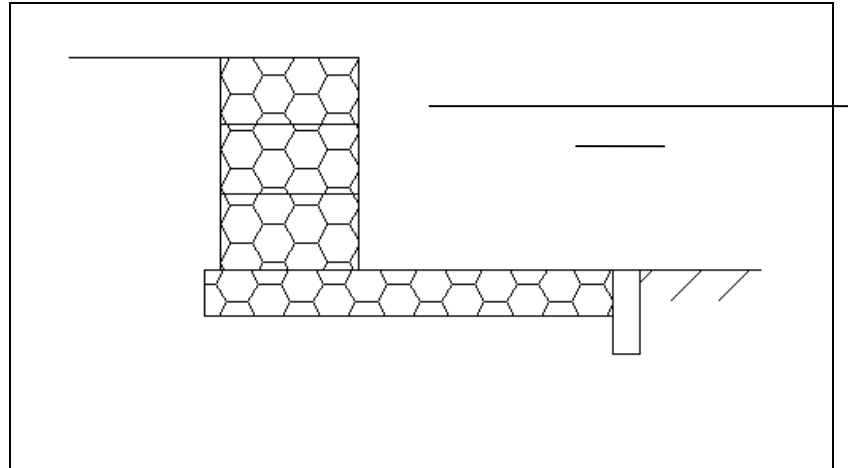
Protecting stream bank with a wall of gabion baskets on a mattress: Typical cross section (Russell, 2007)
